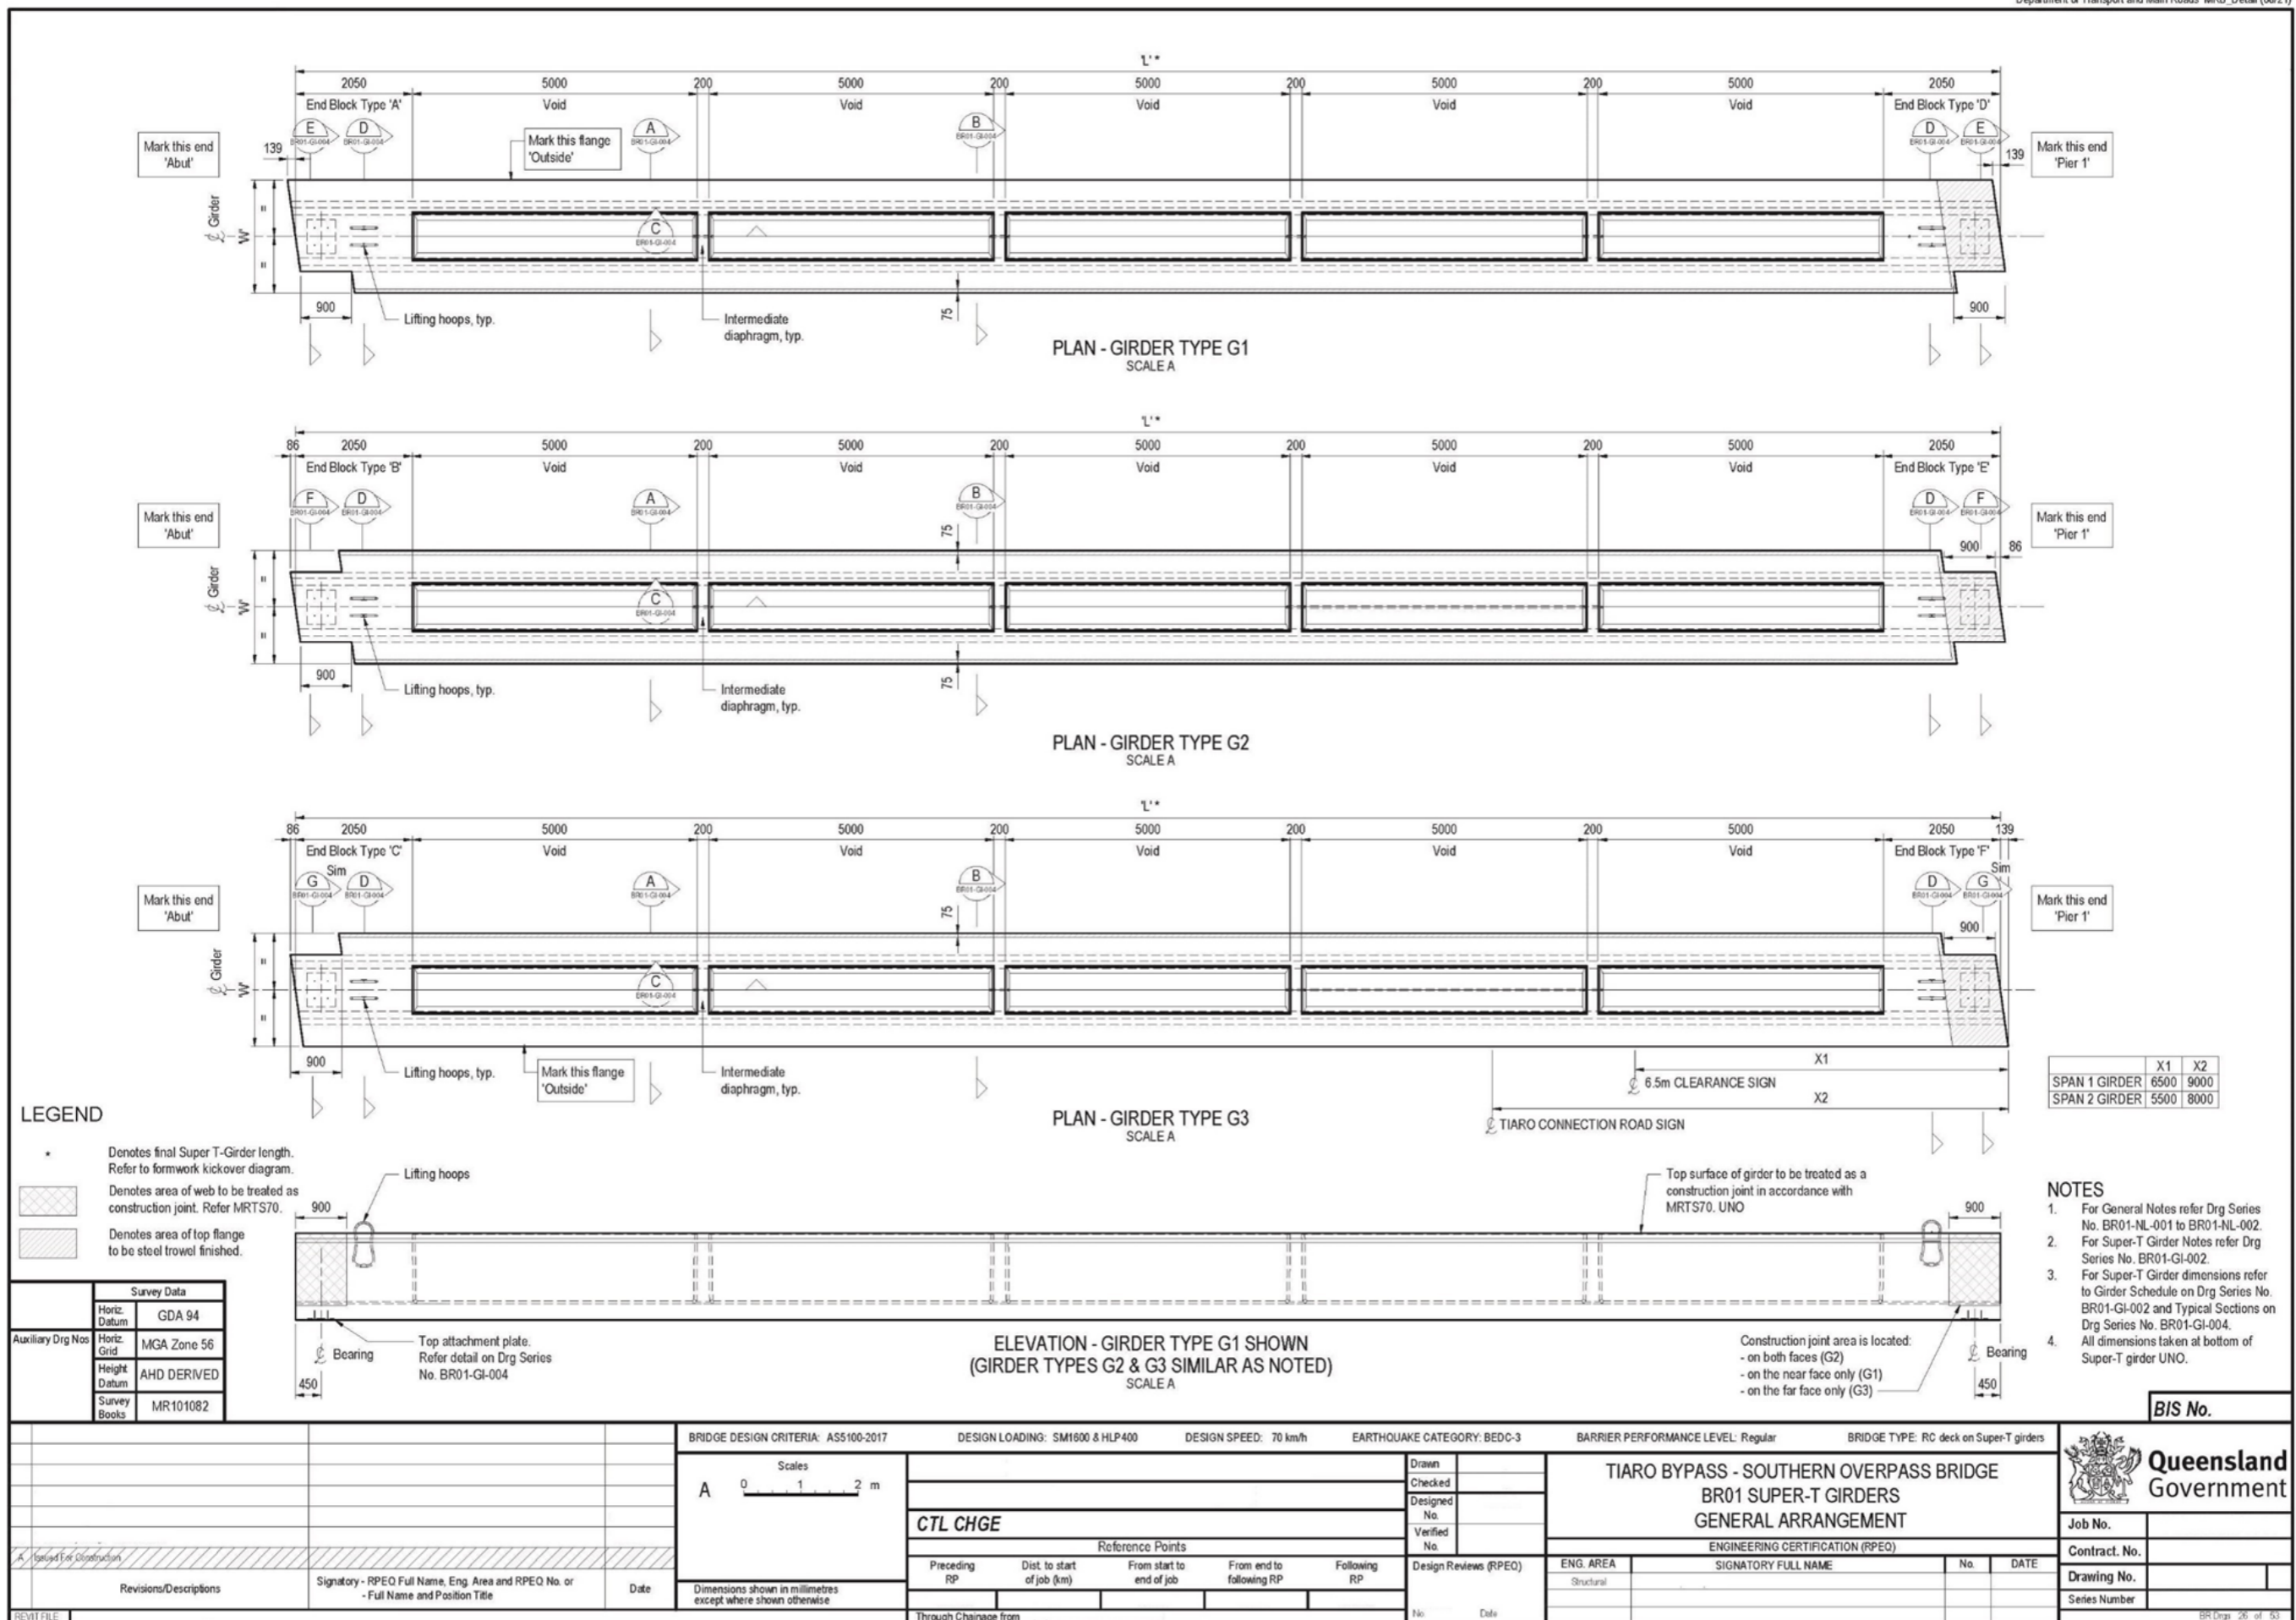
(d) - Example Super-T girder bridge drawings - Sheet 4
